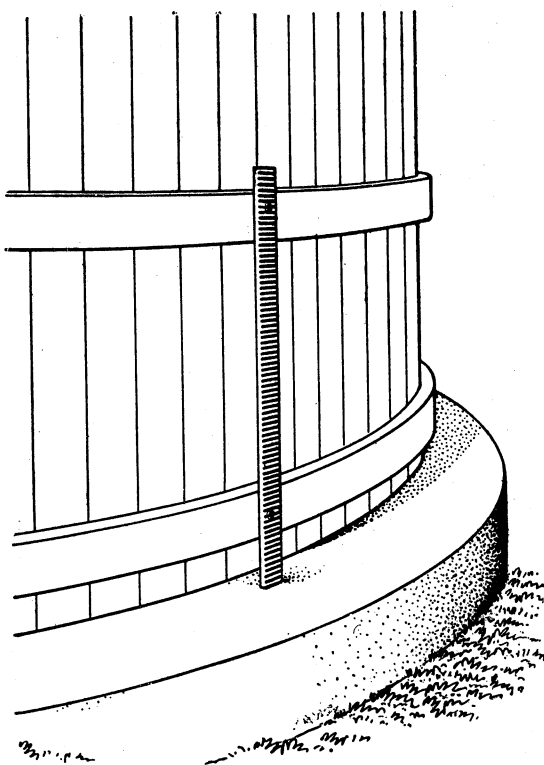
Showing method of bolting wooden-hoop silo to foundation.
